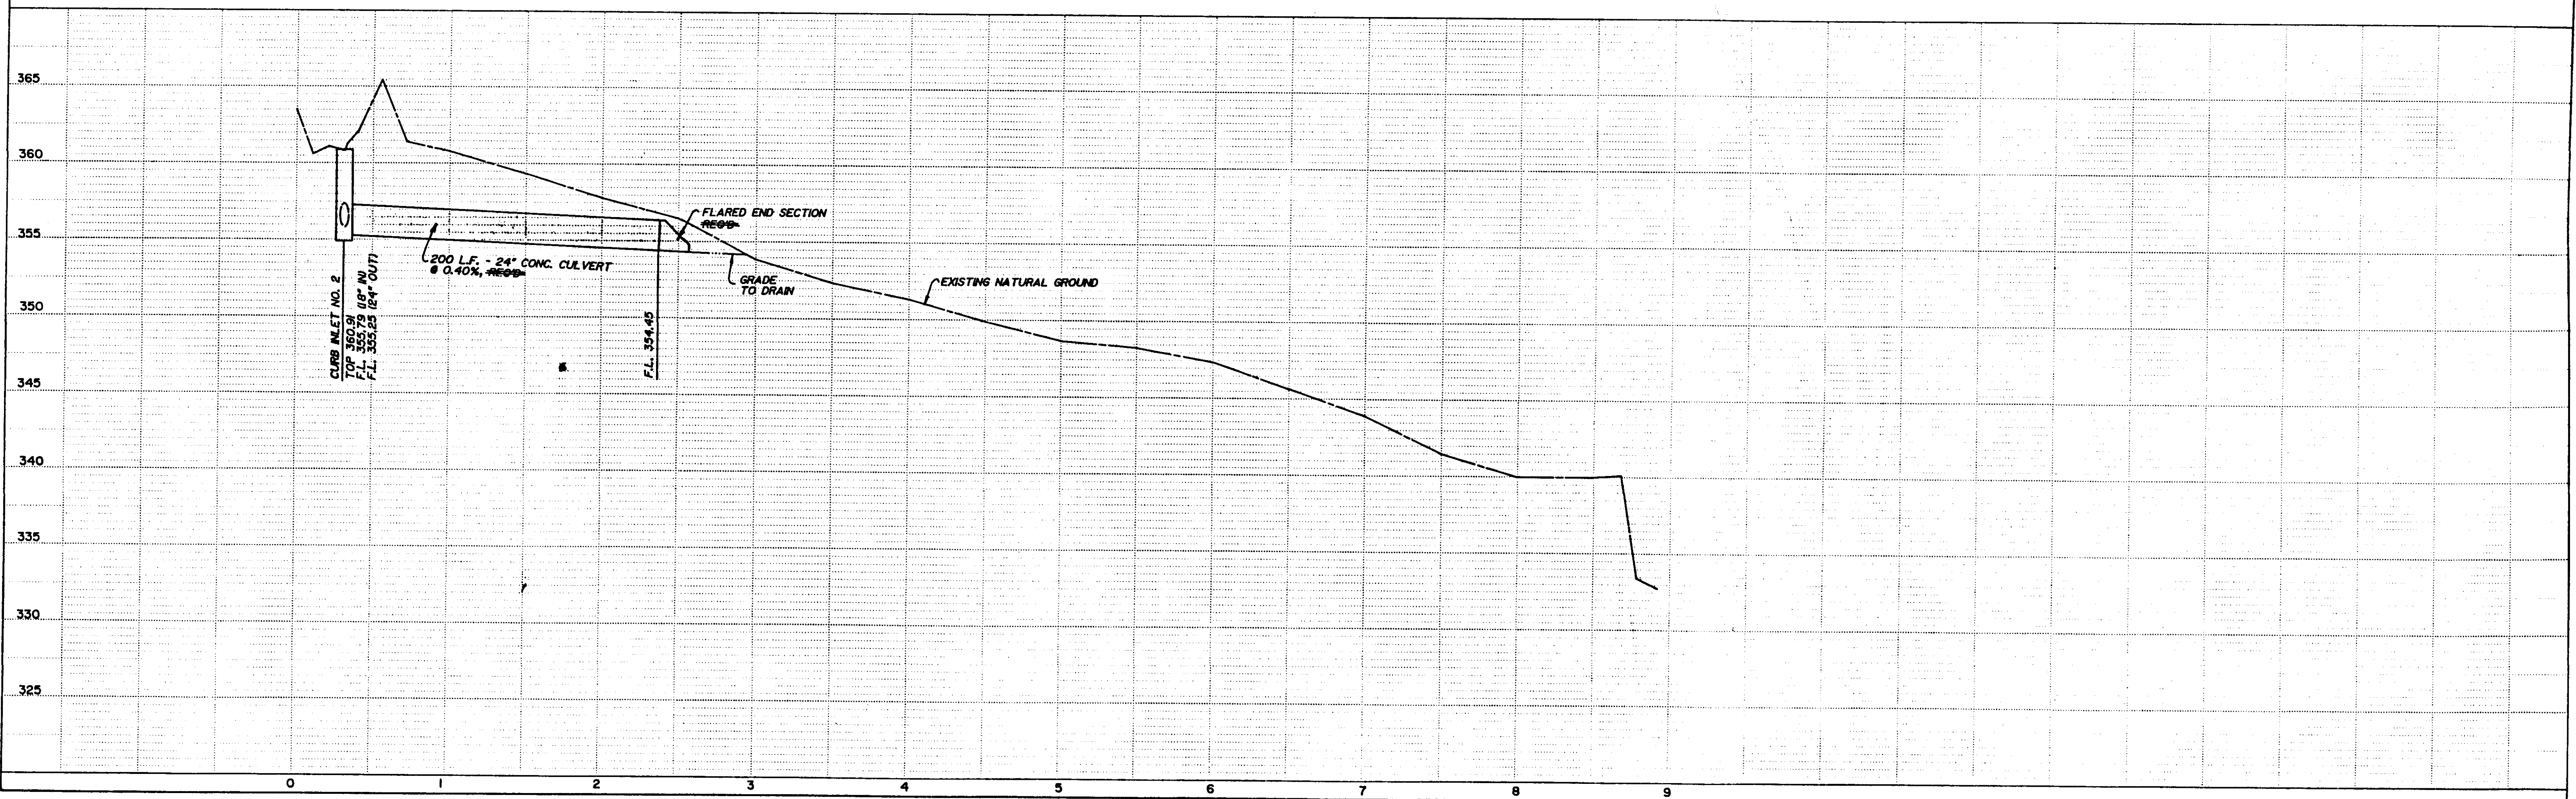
SINGLE PLAN AND PROFILE FULL DOT
